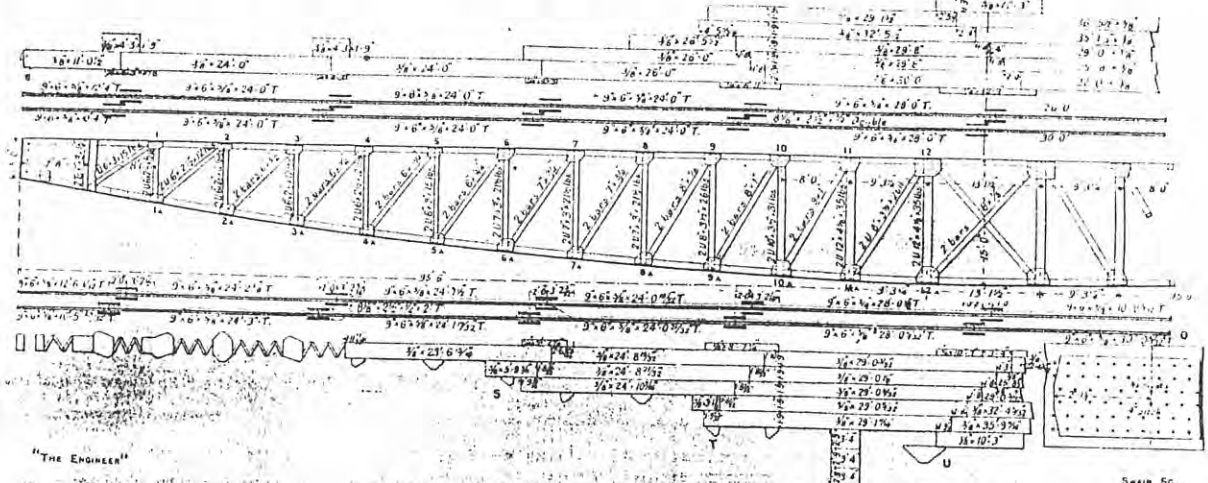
ARRANGEMENT OF PART OF AN INNER GIRDER
